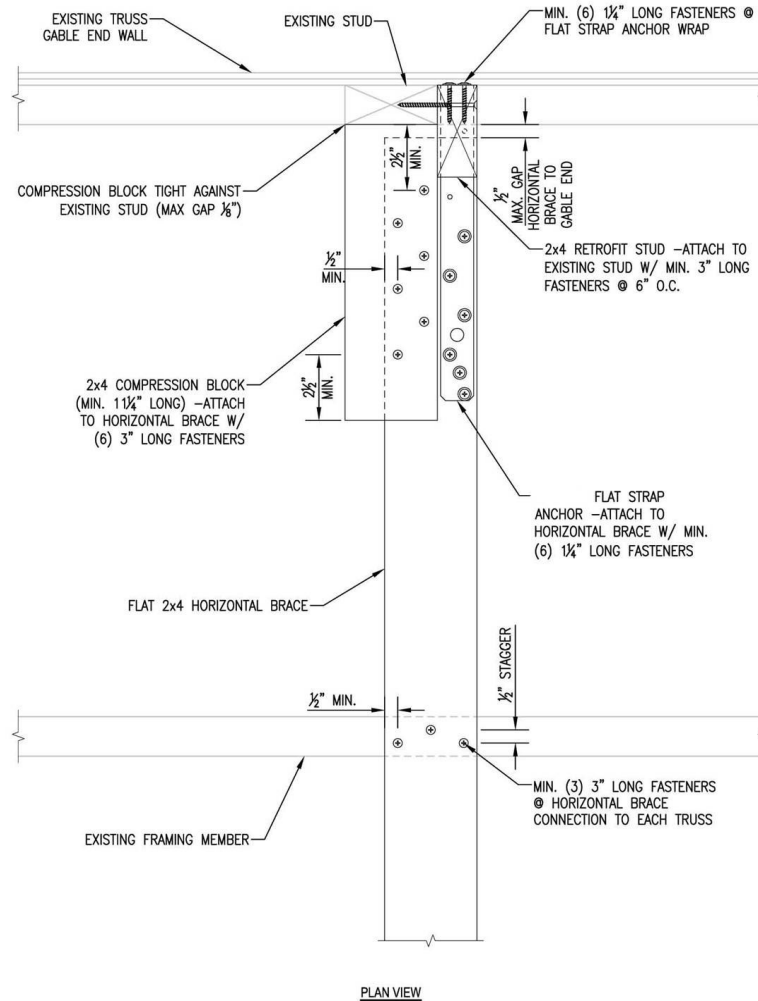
Layout of fasteners on horizontal brace for connection to framing members as well as connections of retrofit stud strap and one option for attachment of compression block.
